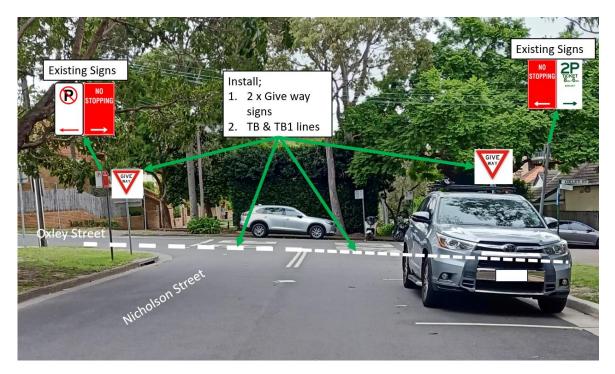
Proposed 'Give Way' Signs and associated line markings on Nicholson Street at Oxley Street
